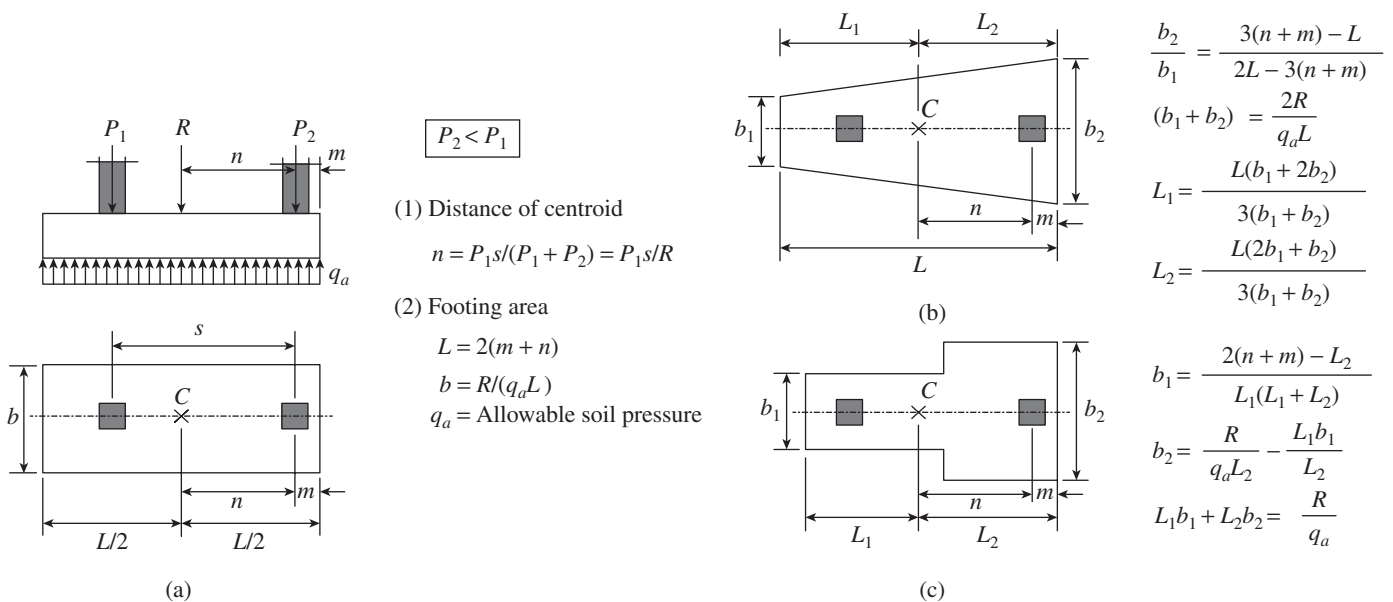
Two-column footings (a) Rectangular (b) Trapezoidal (c) T-shaped
